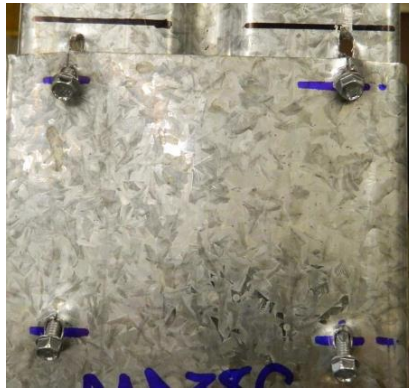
Photograph of typical failure with screws from the front side of specimen. Screws have backed out and torn through base metal. This is a cyclic test specimen.
